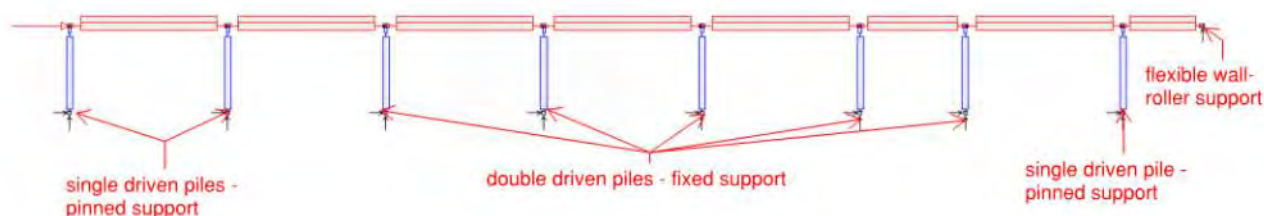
Extract from Microstran model - showing gridline 6 precast concrete frame model
